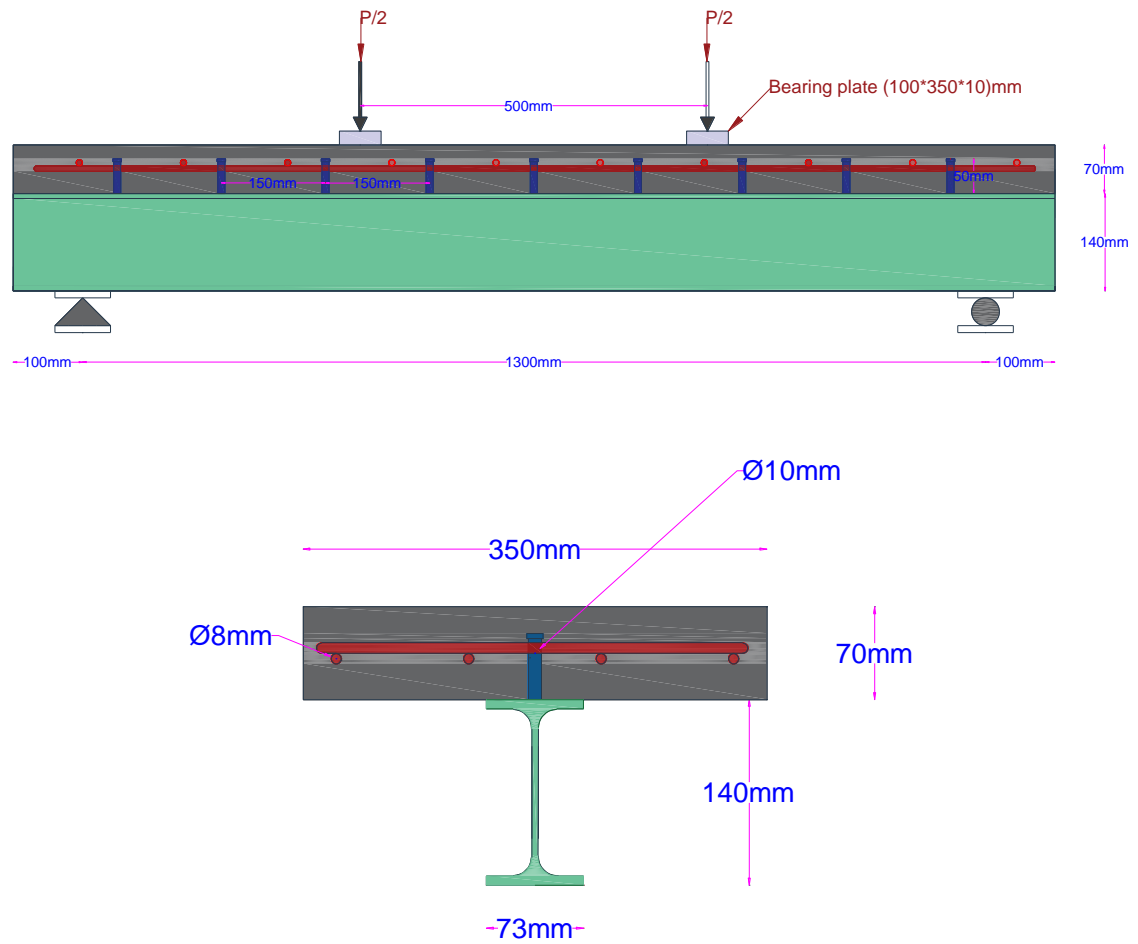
Dimensions and Details of Tested Specimens (Control Beam)
